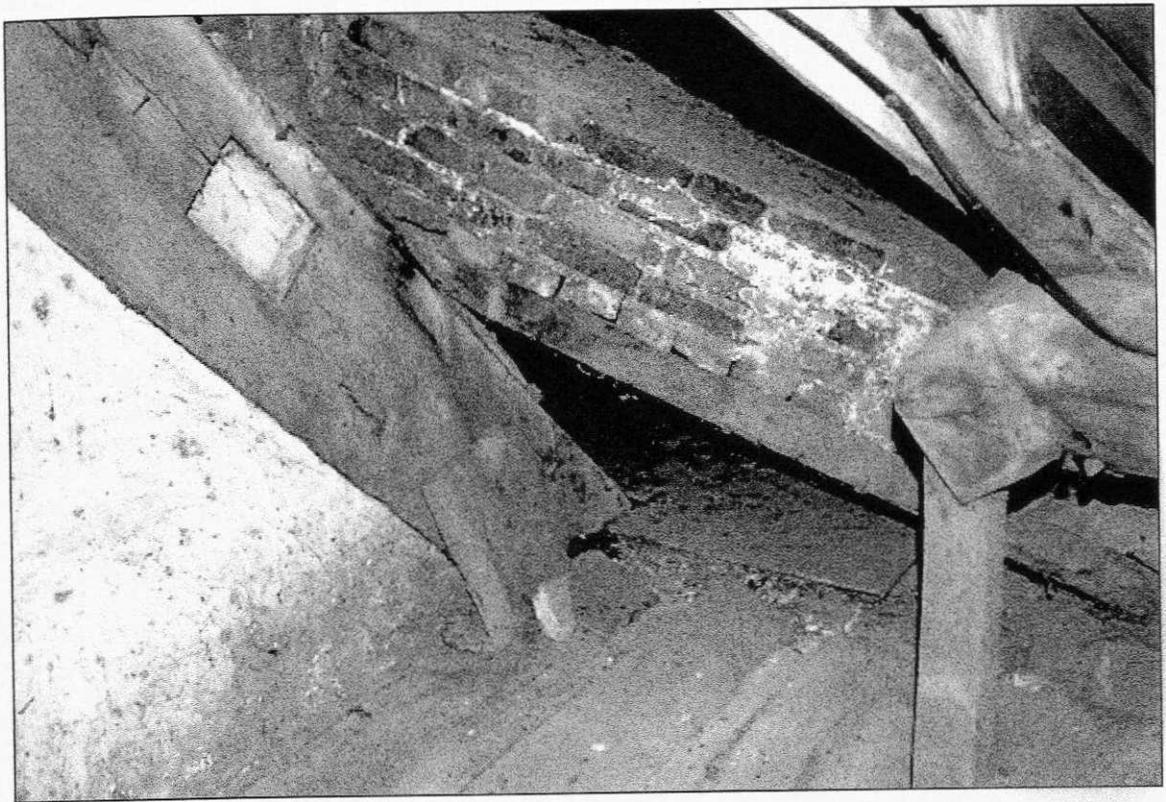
(above): Stub remaining in principal rafter mortice indicates purlin was removed to allow access to bell tower - proving latter is an addition. Also, brick flue from fireplace in breakfast room and chamber above, unusually angled to join flue of kitchen hearth - shows this too was probably added later
